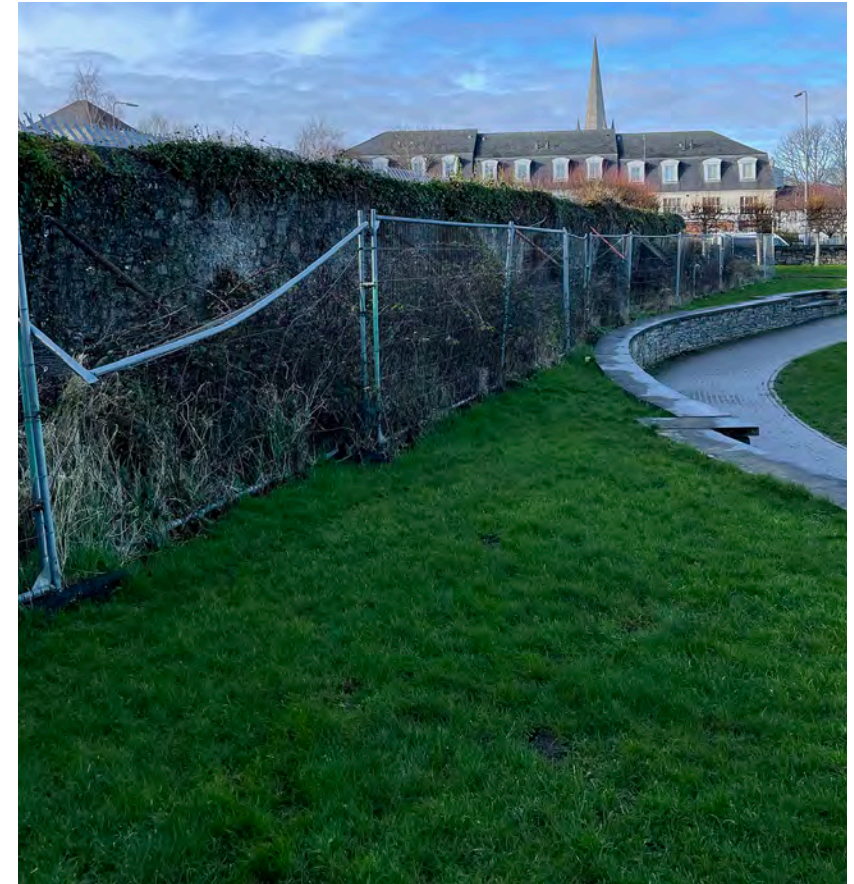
View of Wall E from north garden indicating extent of disrepair
